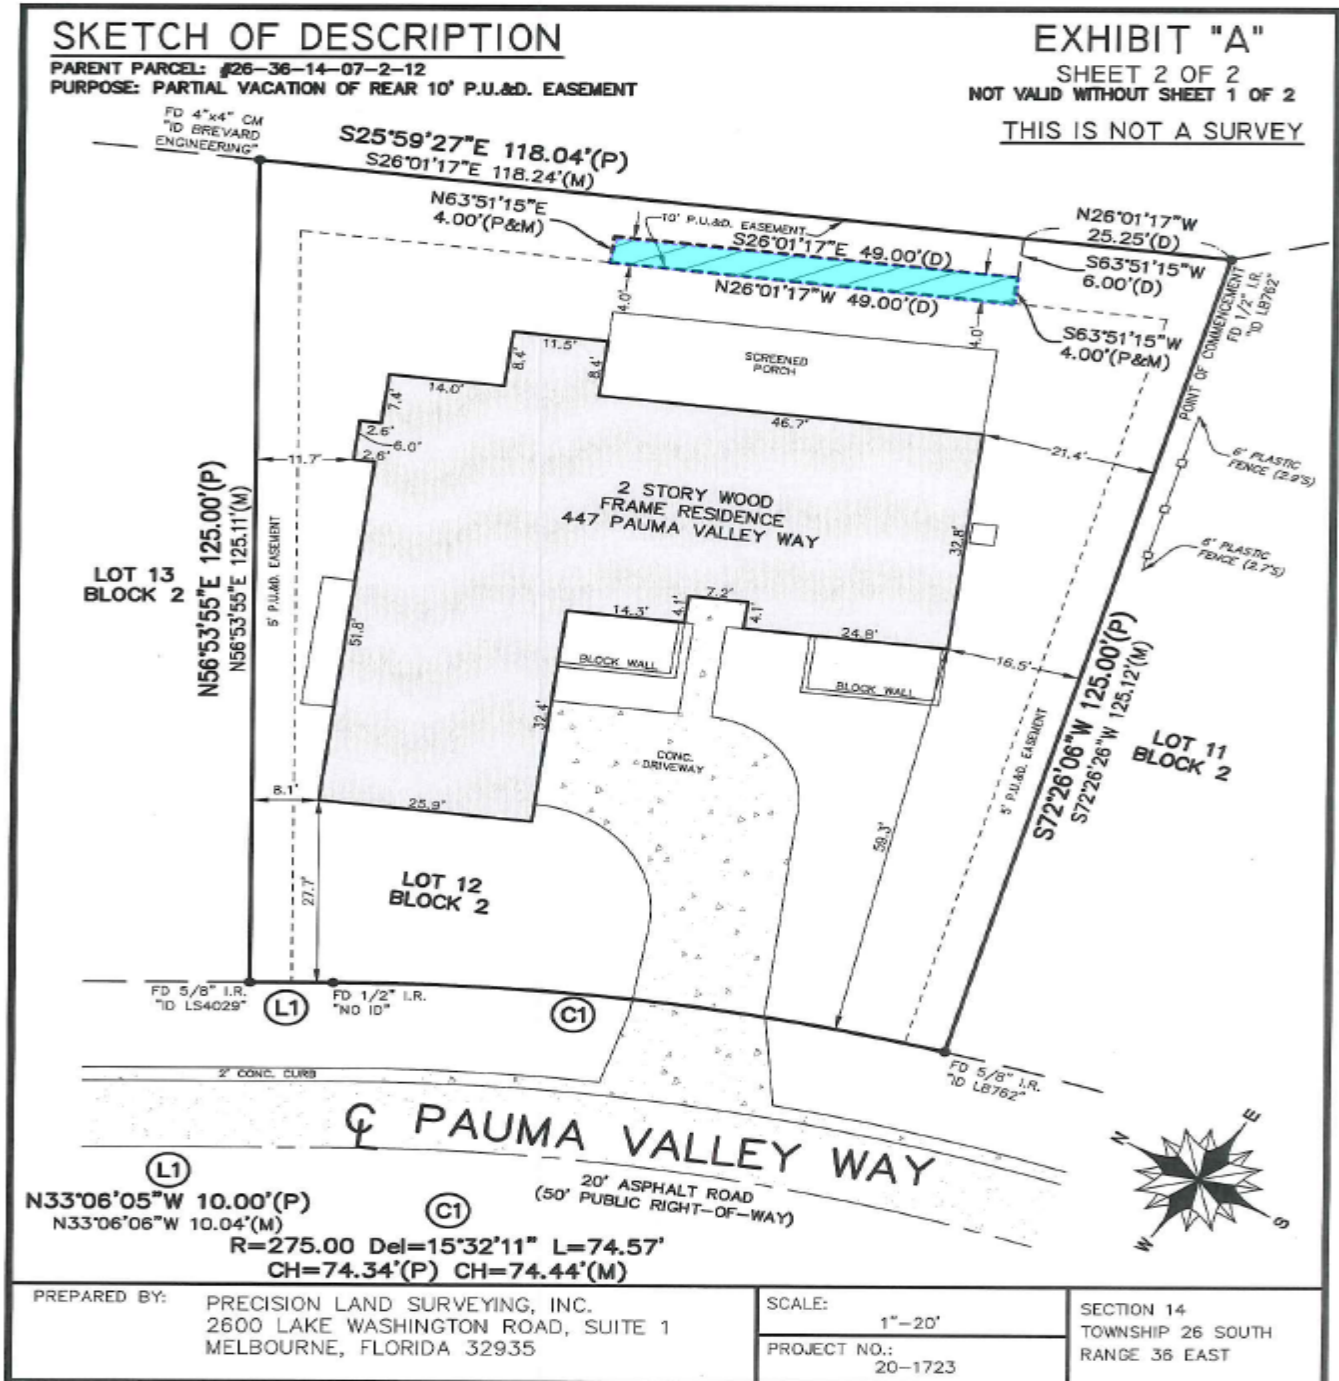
Sketch of Description. Situated in Section 14, Township 26 South, Range 36 East, Parent Parcel: #26-36-14-07-2-12. Sheet 2 of 2. Not valid without legal description on sheet 1 of 2. Sketch illustrates a 4.0-foot strip of a 10.0-foot easement lying on the West side of Lot 12, Twin Lakes at Suntree, First Addition, 447 Pauma Valley Way, Melbourne, Florida. The coordinates of the area depicted is as follows moving North to East clockwise. North boundary – North 56°53'55" East 125.00'; East boundary South 25°59'27" East 118.04', South boundary – South 72°26'06" West 125.00'. Prepared by: Precision Land Surveying, Inc., FL LB# 6586. Project NO: 20-1723.
